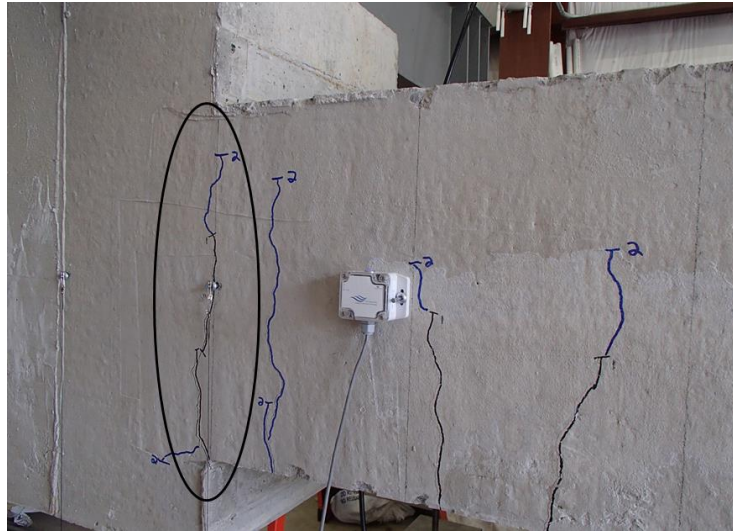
Critical flexural crack near the center column (Specimen 3)
